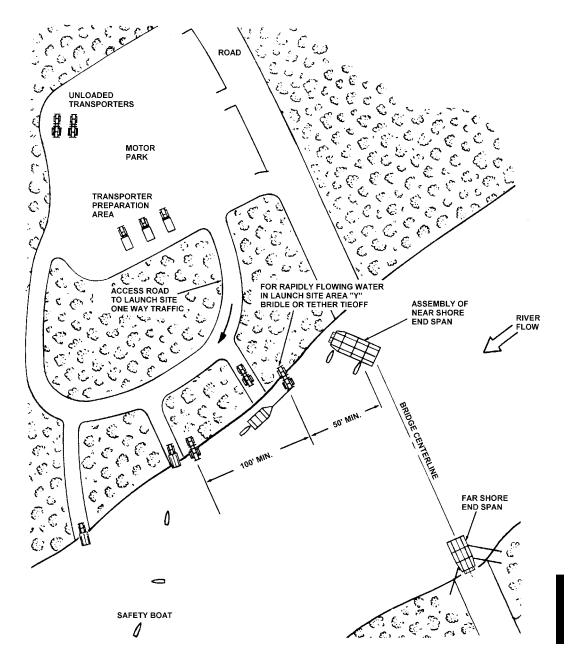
Bridge Assembly Site Layout for Multi-Launch Site (Successive Bay Assembly).
